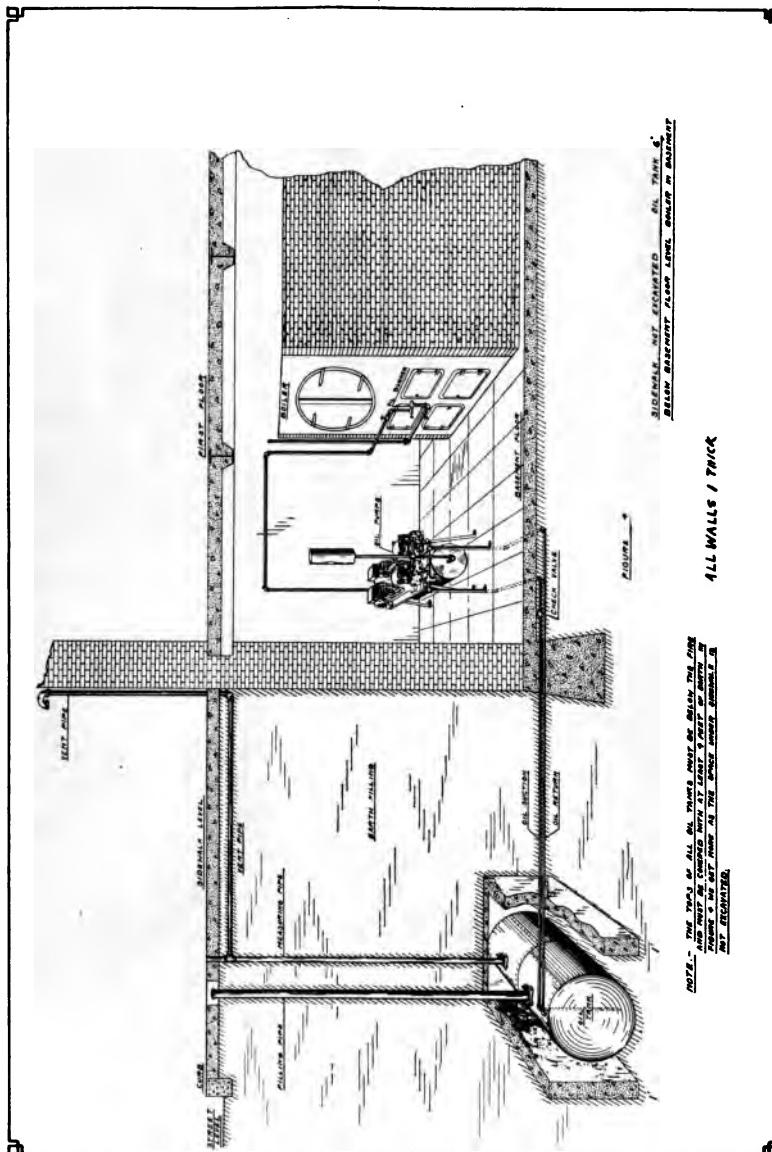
Showing Approved Method of Installation for a High Pressure Plant
